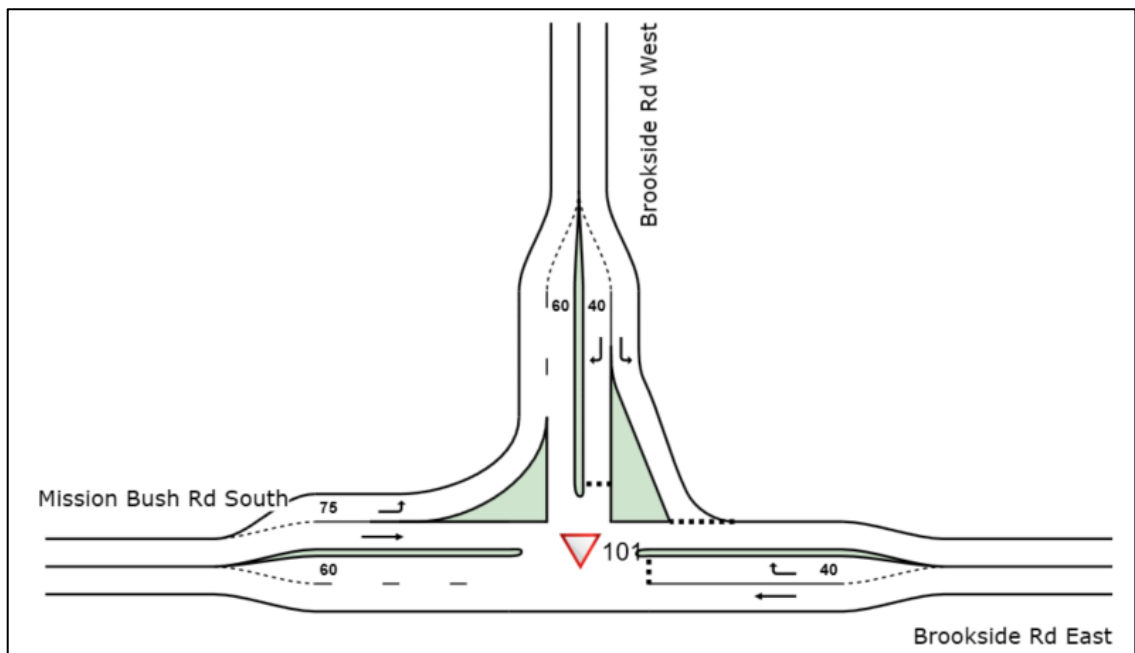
Brookside Road / Mission Bush Road Modelling Layout
